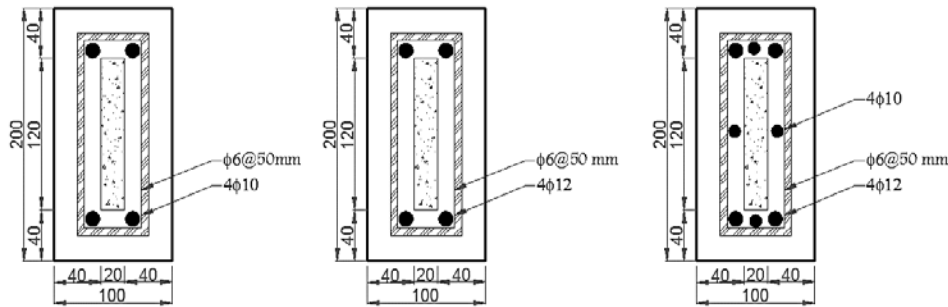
Hybrid beam with different longitudinal reinforcement.
